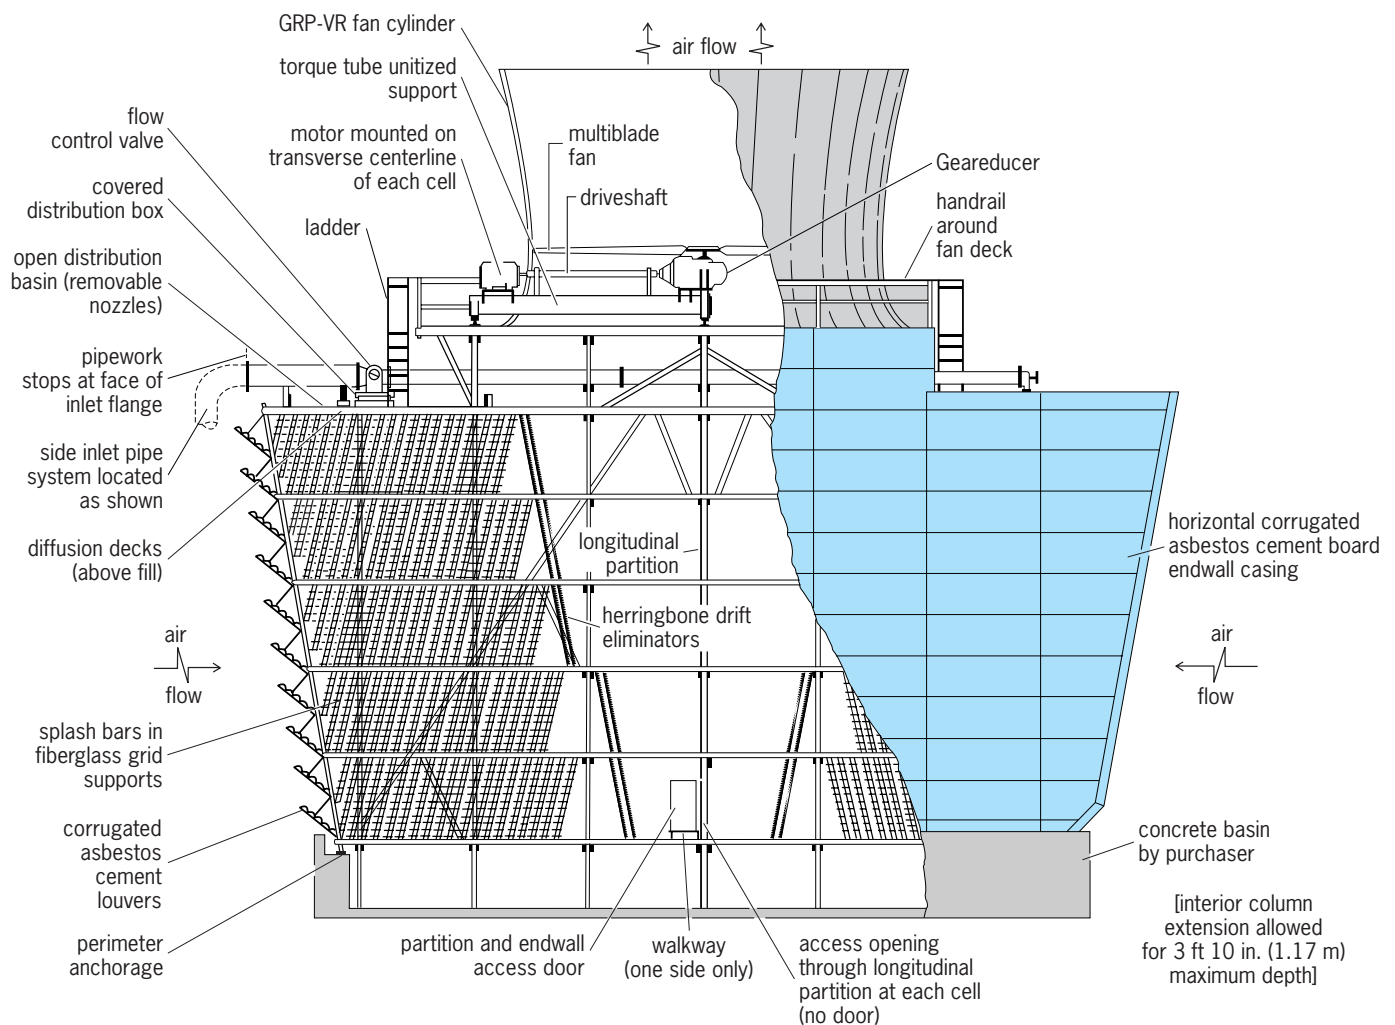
Transverse cross section of a cross-flow evaporative cooling tower.
